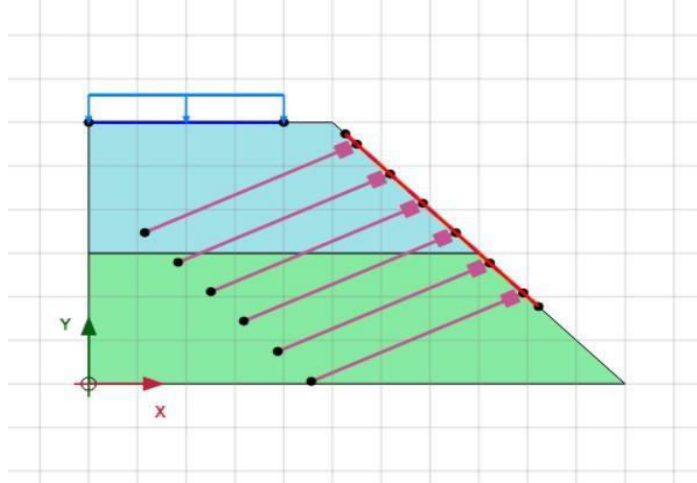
HYBRID SYSTEM OF NAILING AND BIO-GEOTEXTILE
